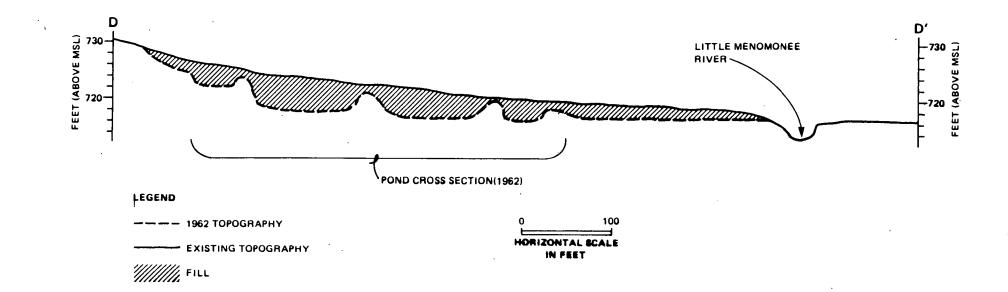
CROSS SECTION THROUGH SETTLING PONDS MOSS AMERICAN RI
